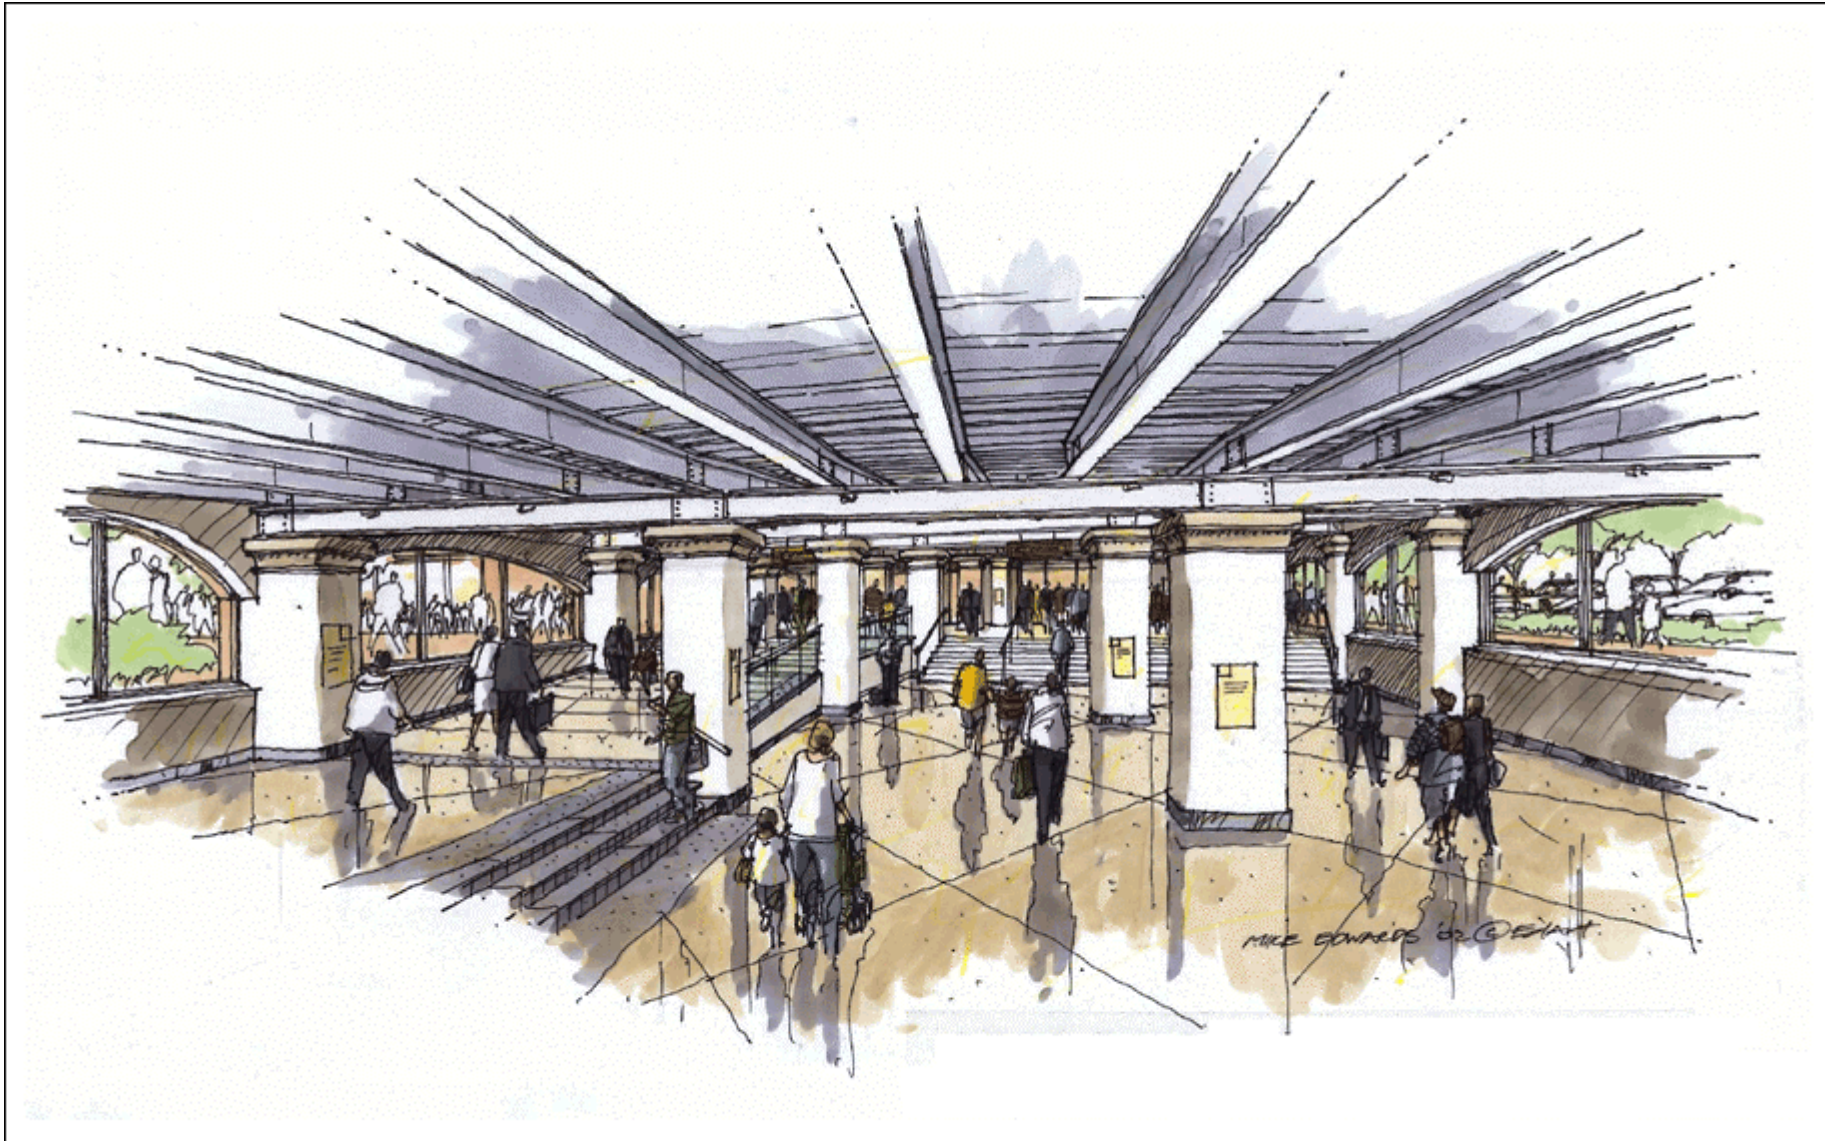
New Station Foyer Under the Horseshoe Bridge
